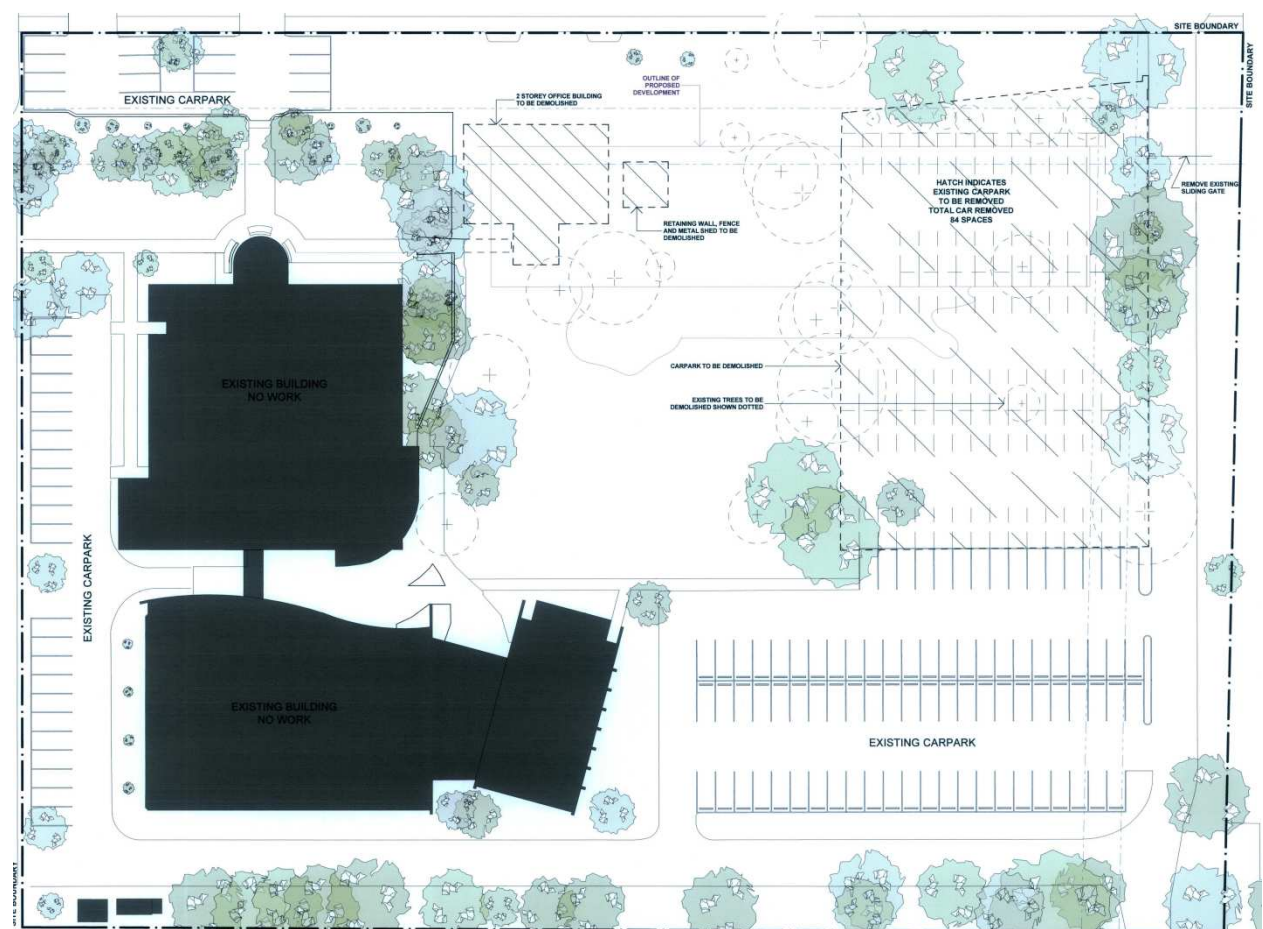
Hatched area indicates existing carpark to be removed and 2 storey commercial building (Building B) and metal shed. The dotted circles are existing trees to be demolished.
